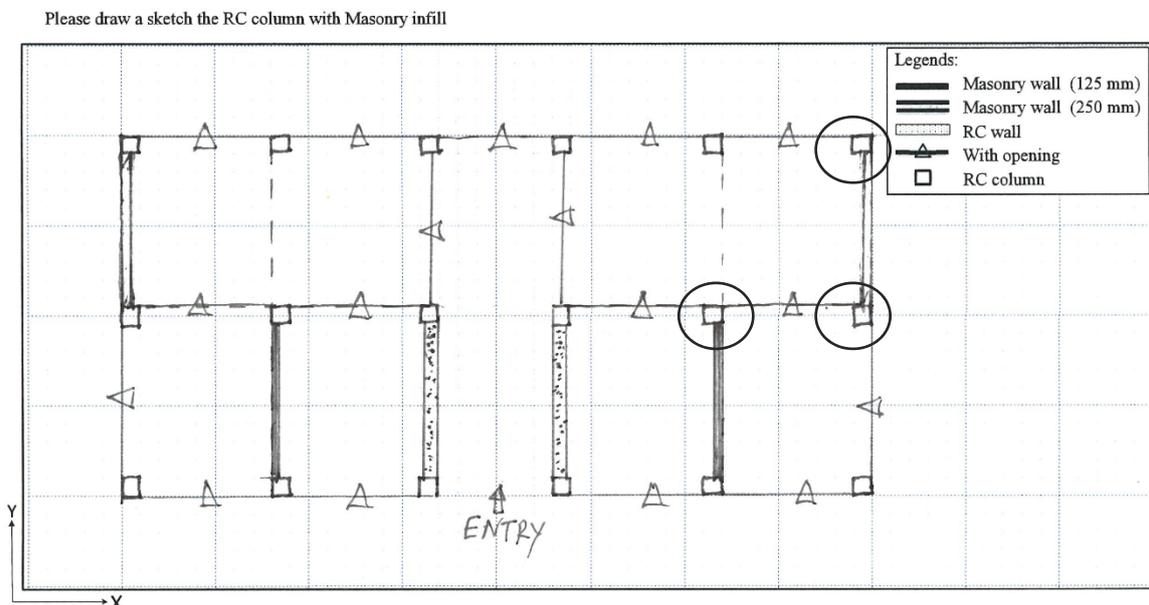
Selecting three columns from column layout of the building for Average Column Size
